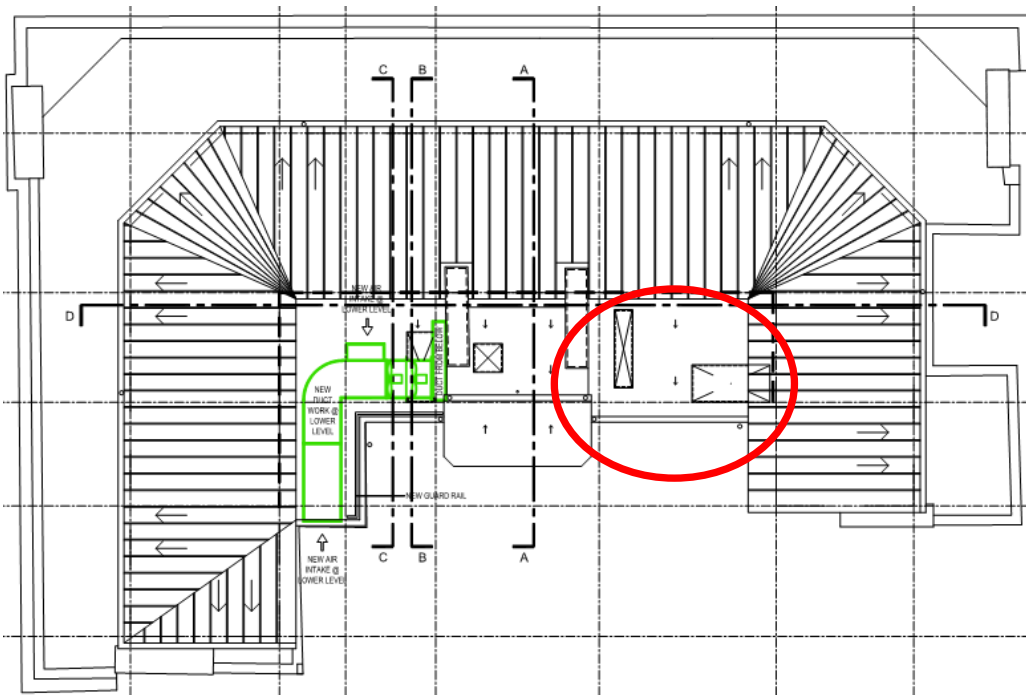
Location of proposed plant on roof in green, with current location circled in red
